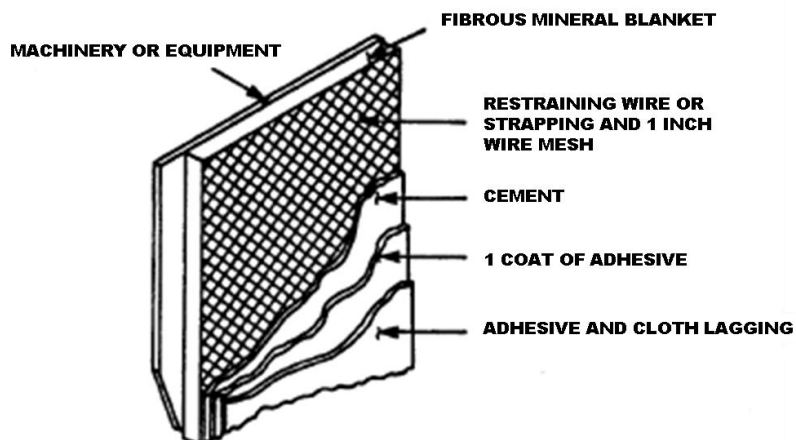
Application of mineral fiber blanket conforming to MIL-PRF-2818 to machinery and equipment (temperature range 125 to 1000 °F).
